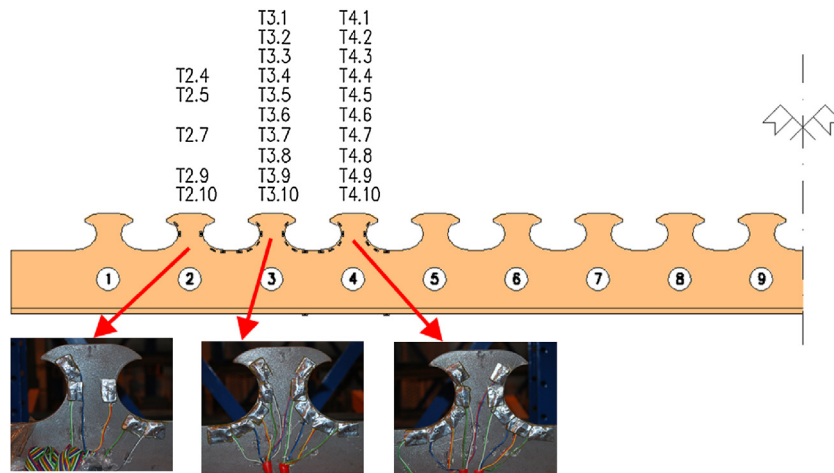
Strain gauges at steel dowels placed at the single beam.
